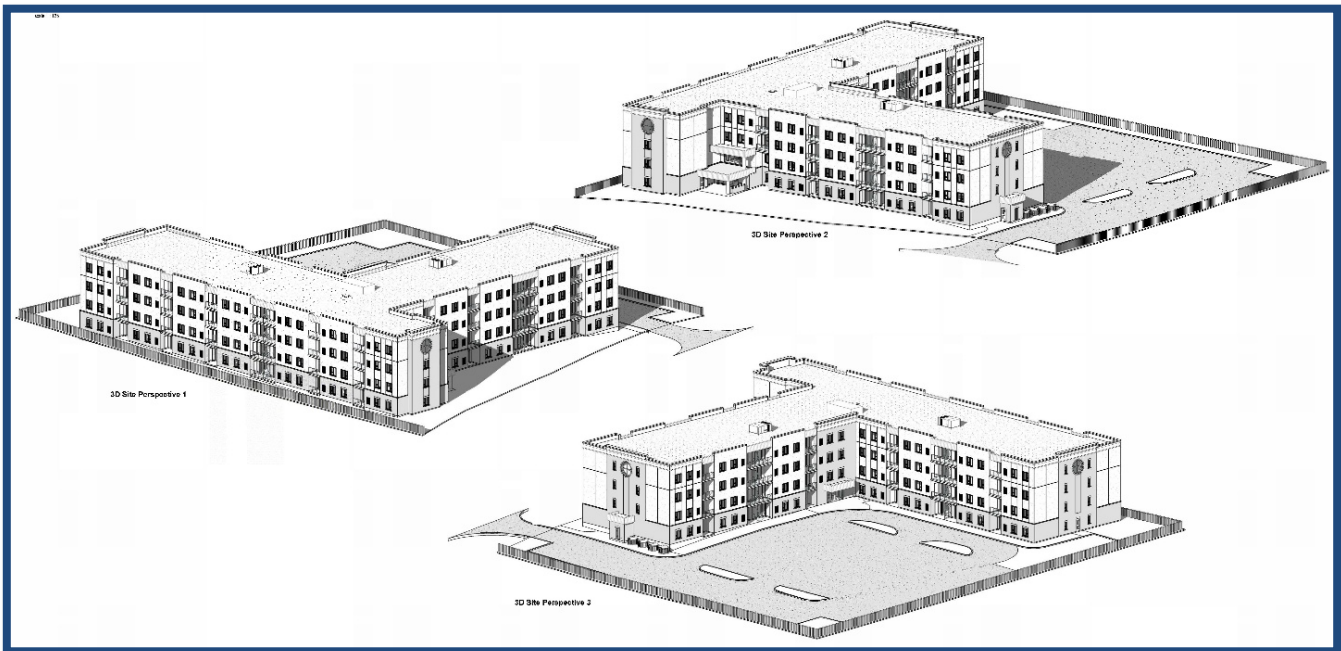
Excerpt of Appendix I – Conceptual Dwelling Elevations
